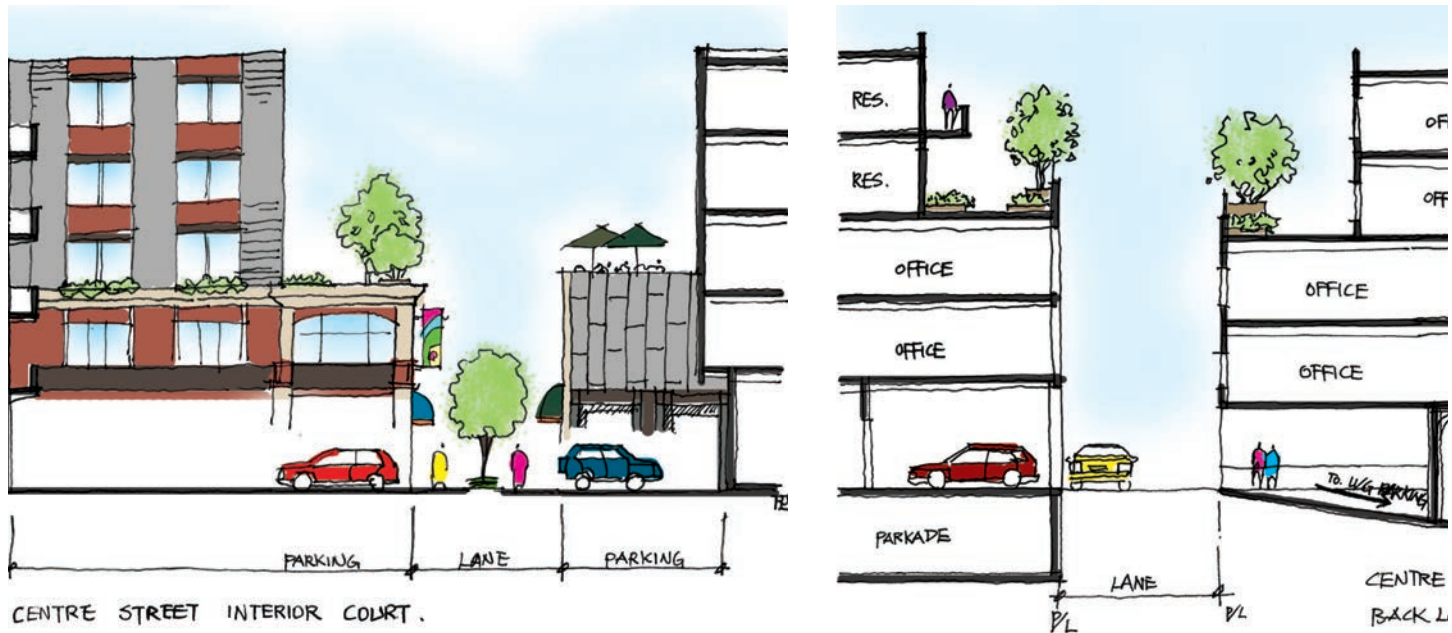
Centre Street - Example Lane-Accessed Structured Parking Interface Alternatives (4.4.4.f)
